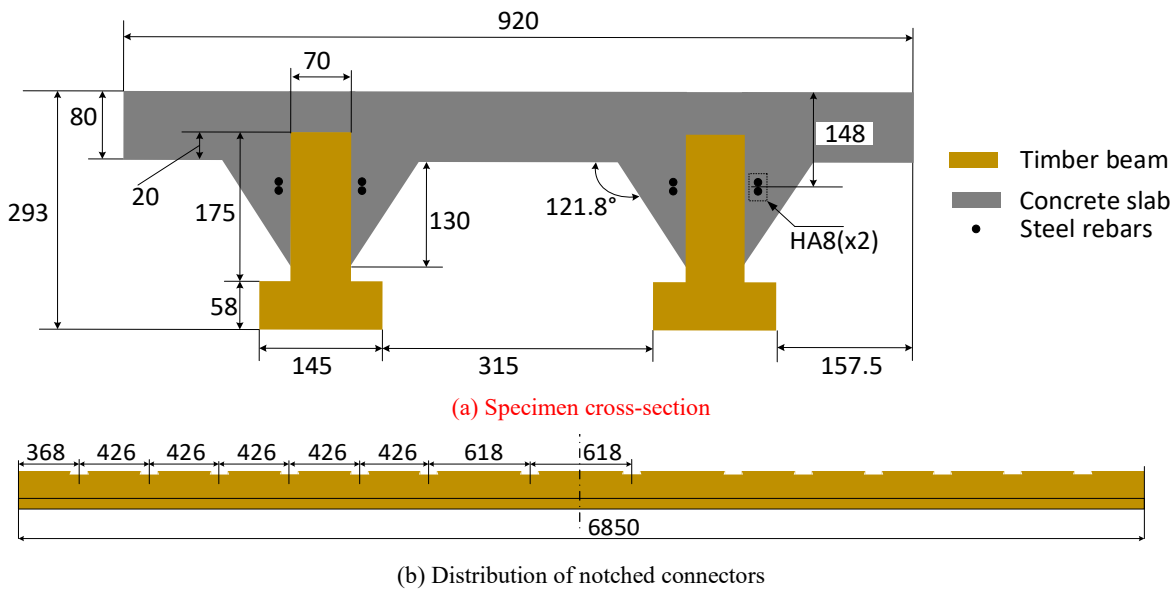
Details of timber-concrete composite floor (dimensions in mm).
